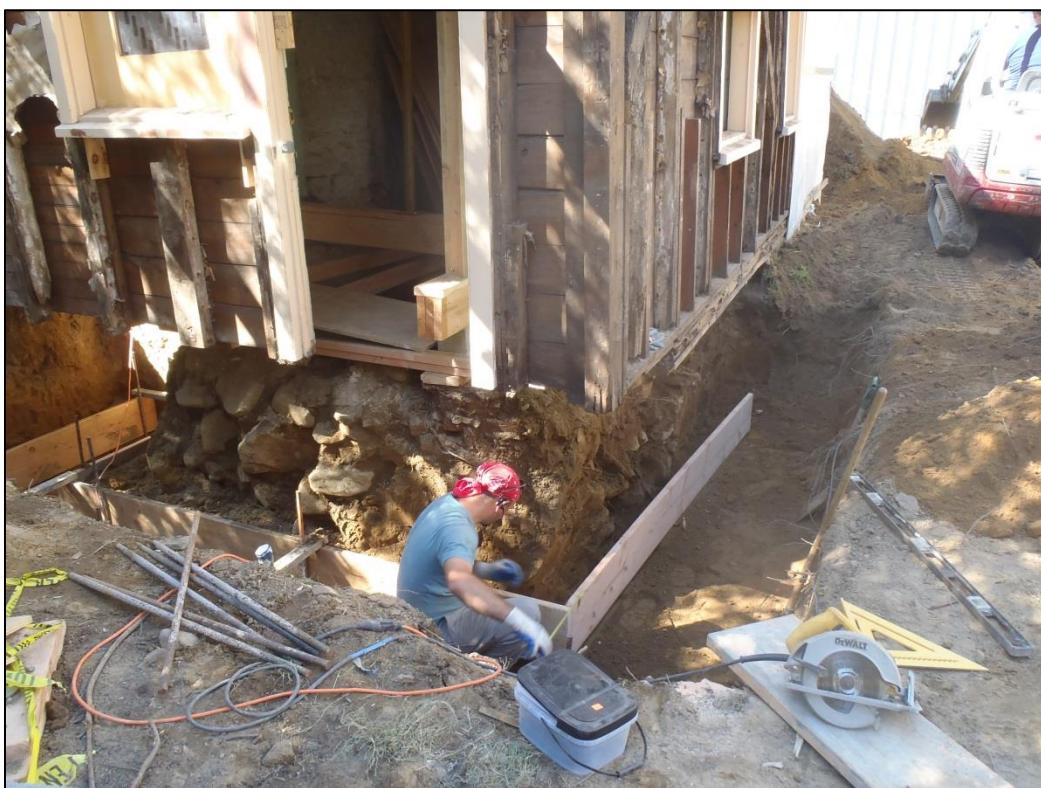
Trench 3 – Form for concrete foundation; adjacent to Room 115.
